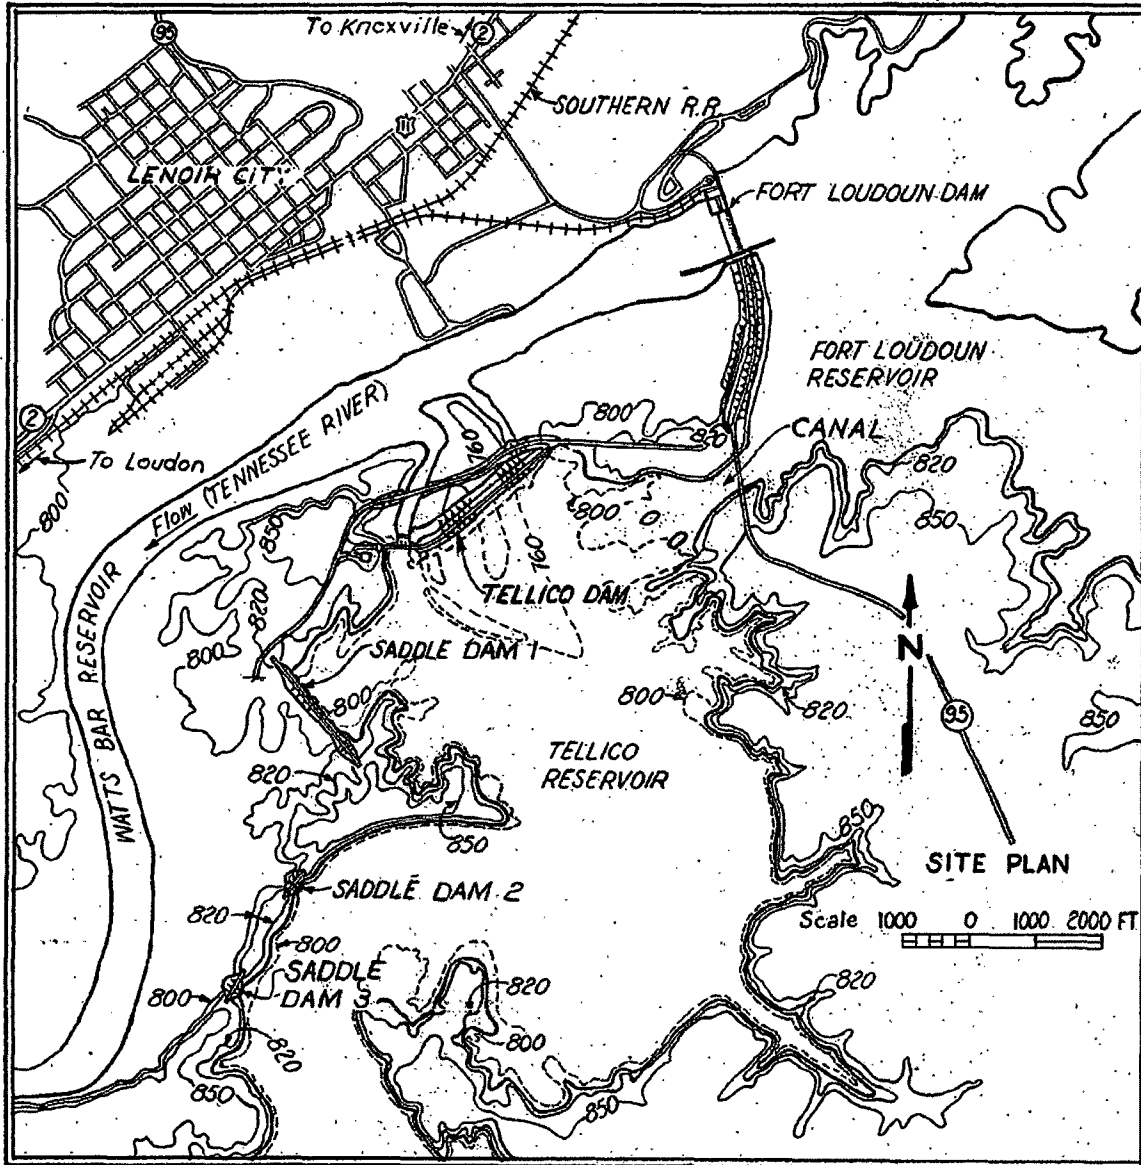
Tellico Dam, General Plan (Ref. 2.1.1, Att. E1).
